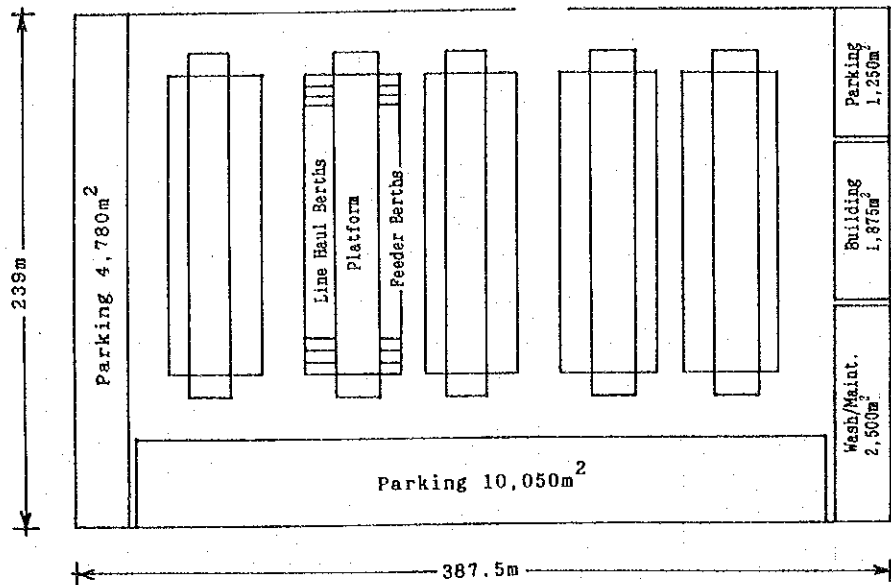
Alexandria Truck Terminal Schematic Layout
